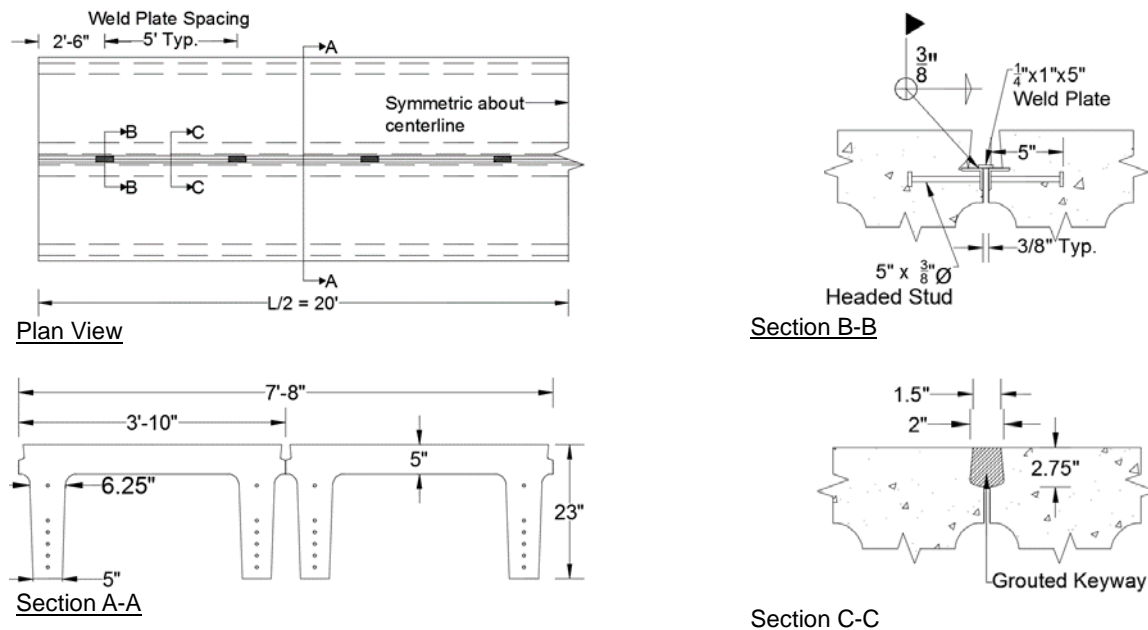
Grouted Shear Keyway with Discrete Welded Connections
